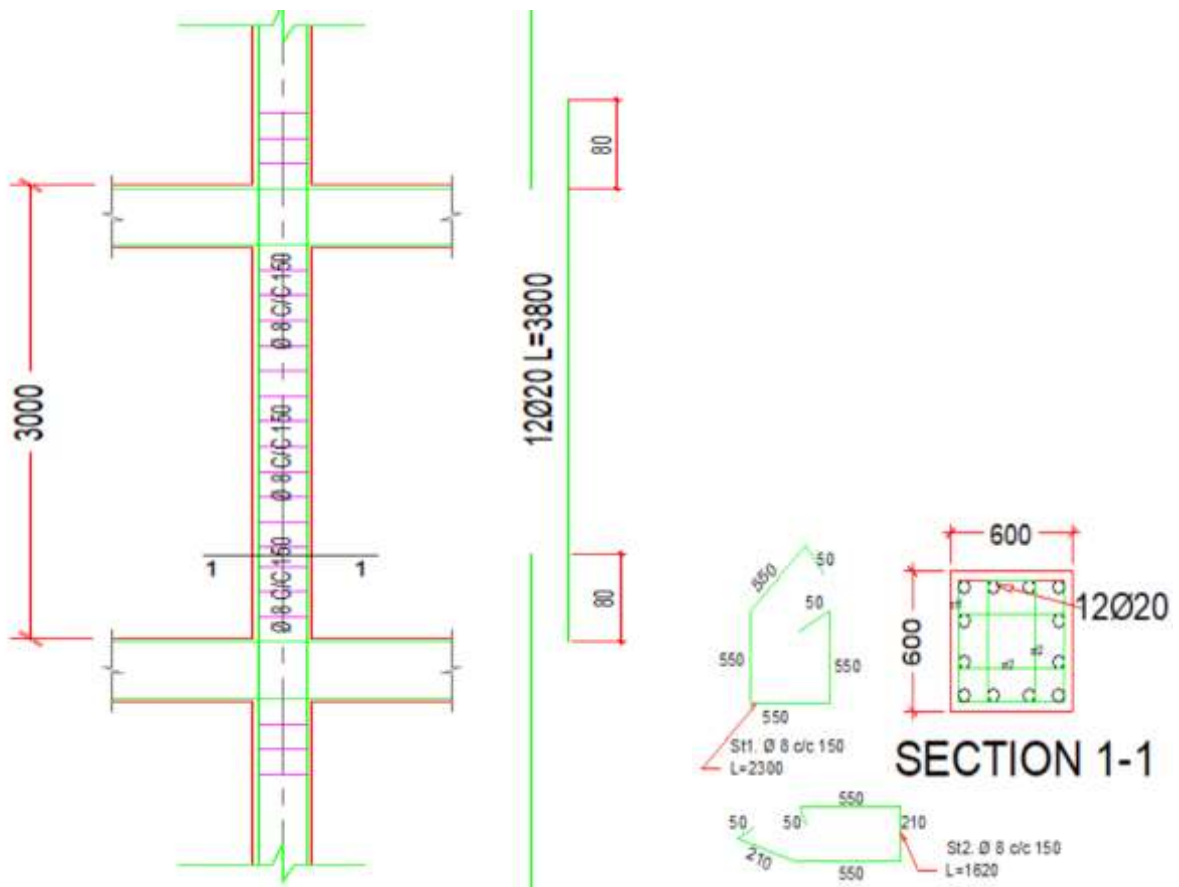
Sample detailing of a column in DCM favorable model
